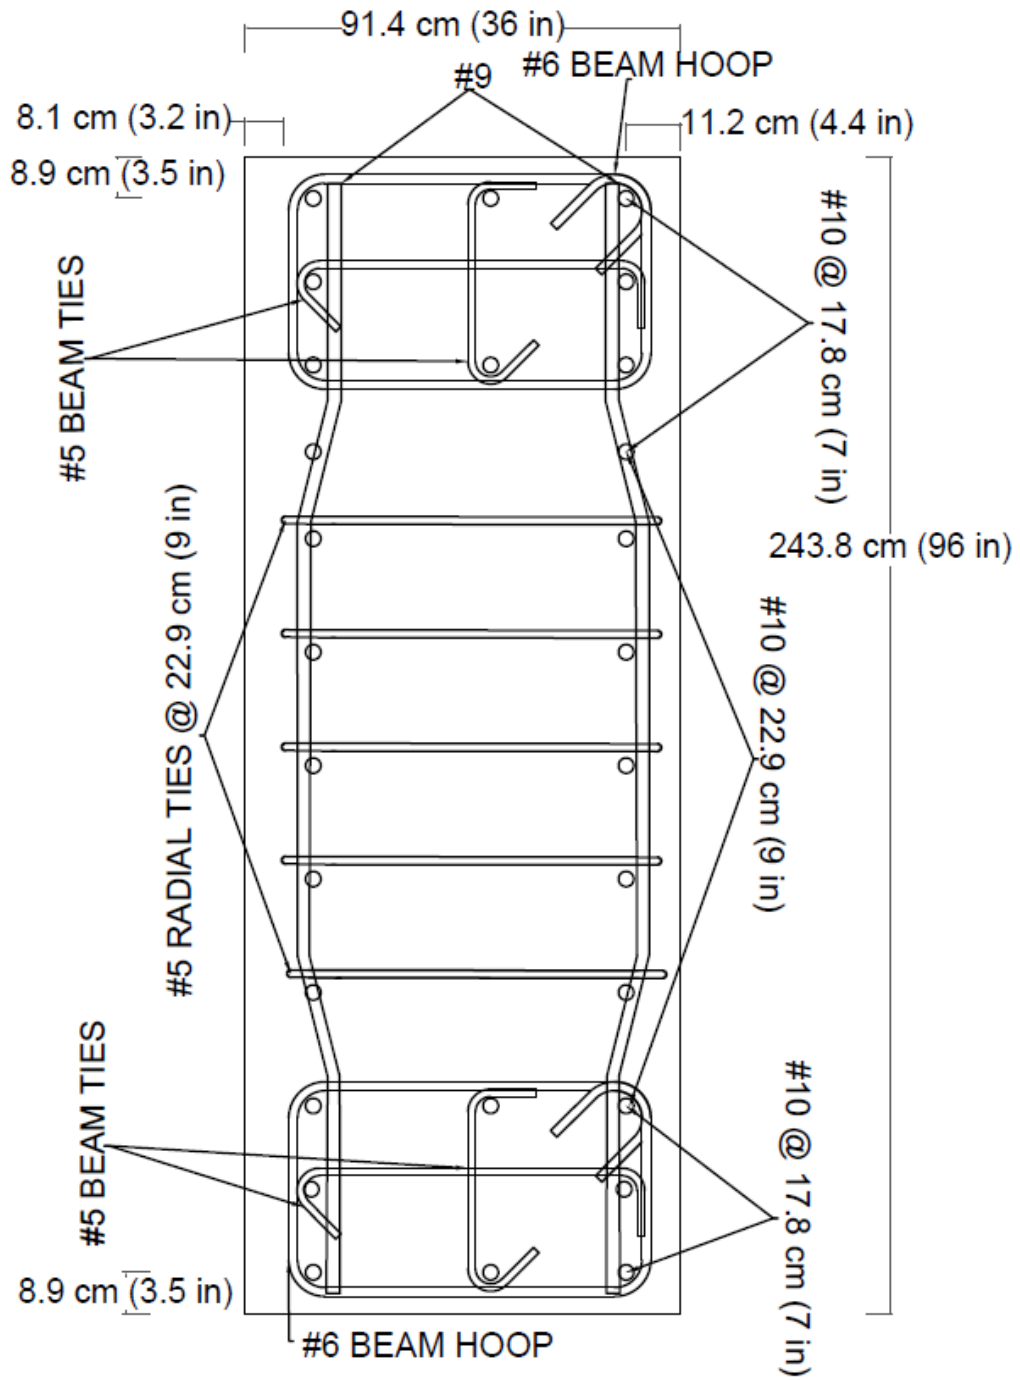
Specimen 2- Reinforcing Steel Layout Side View C-C
